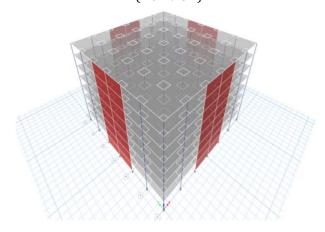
Flat Slab with Shear Wall having (G+8) story building (3D View)
